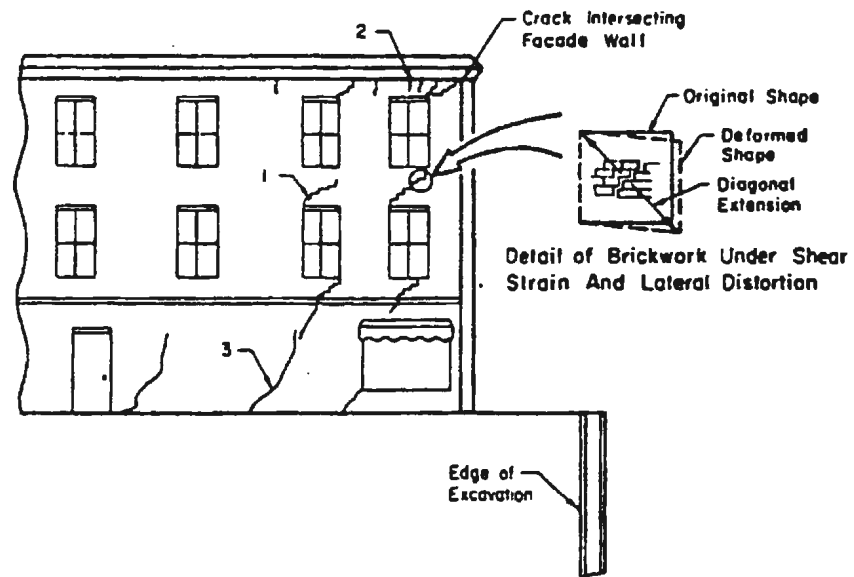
Typical fracture patterns observed in brick-bearing wall structures adjacent to excavations, after O'Rourke et al, 1976
